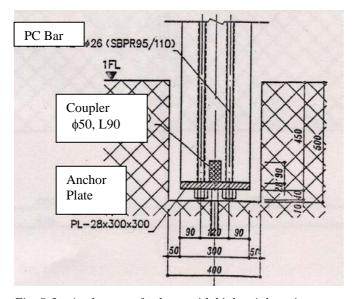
Anchorage of column with high axial tension [Okamoto, 2000]
